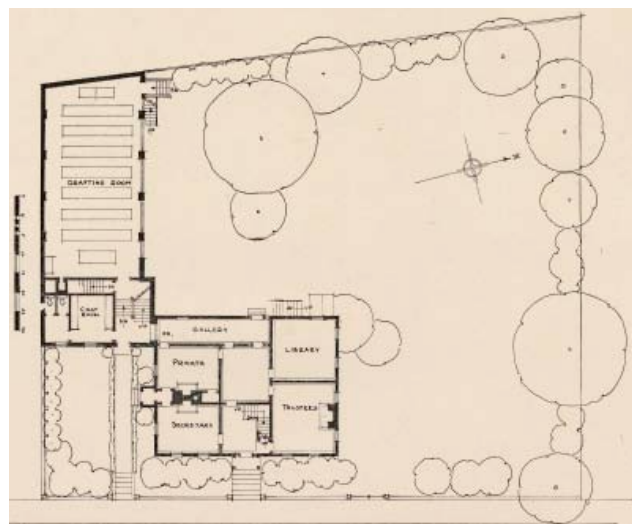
Cambridge School, plan (*Cambridge School Bulletin* 1, no. 1 [Dec. 1928], Smith College Archives)
